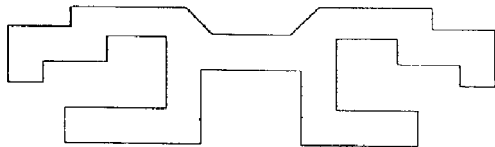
REVERSIBLE WINDOWS - GA (MILA-TOP SWING GEAR)
